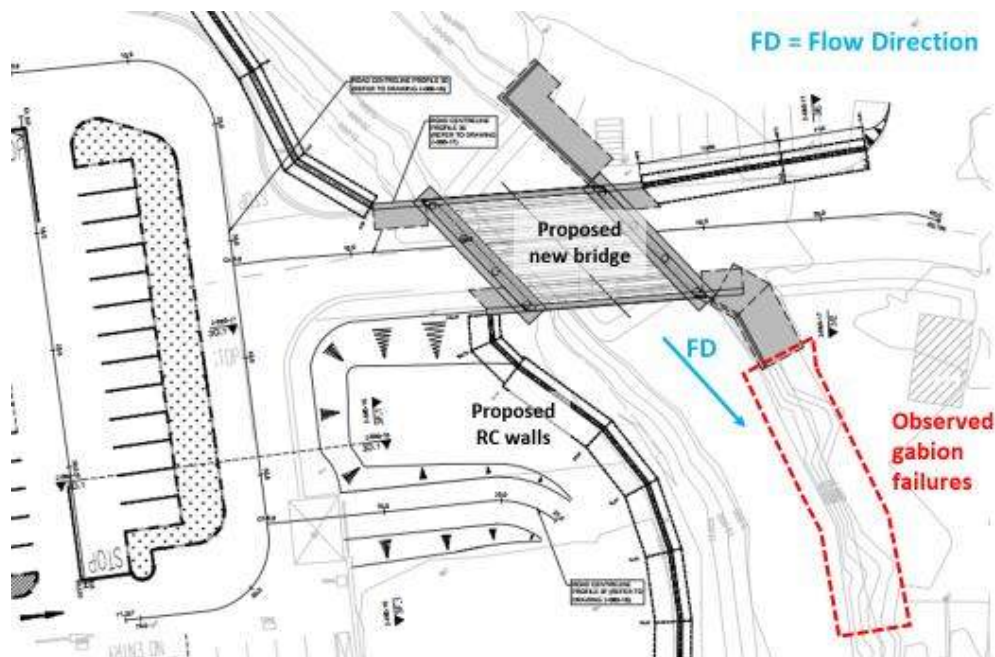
Observed bank failure relative to proposed elements of scheme (including new Hazelwood Shopping Centre bridge and RC walls)
